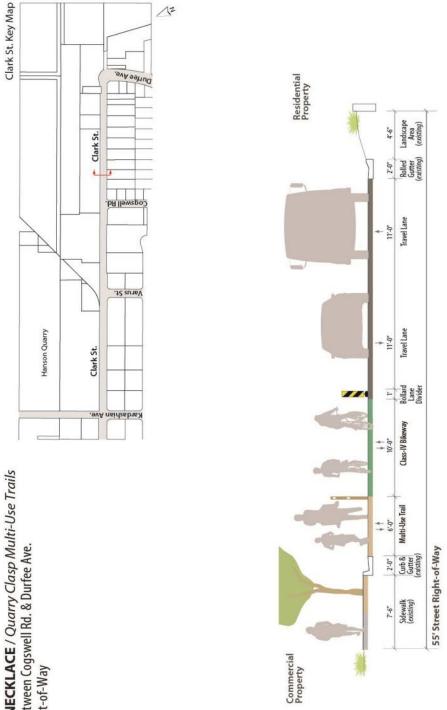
Cross section multi-use trail and Class-IV bikeway on Clark St. with residential properties to the south.
